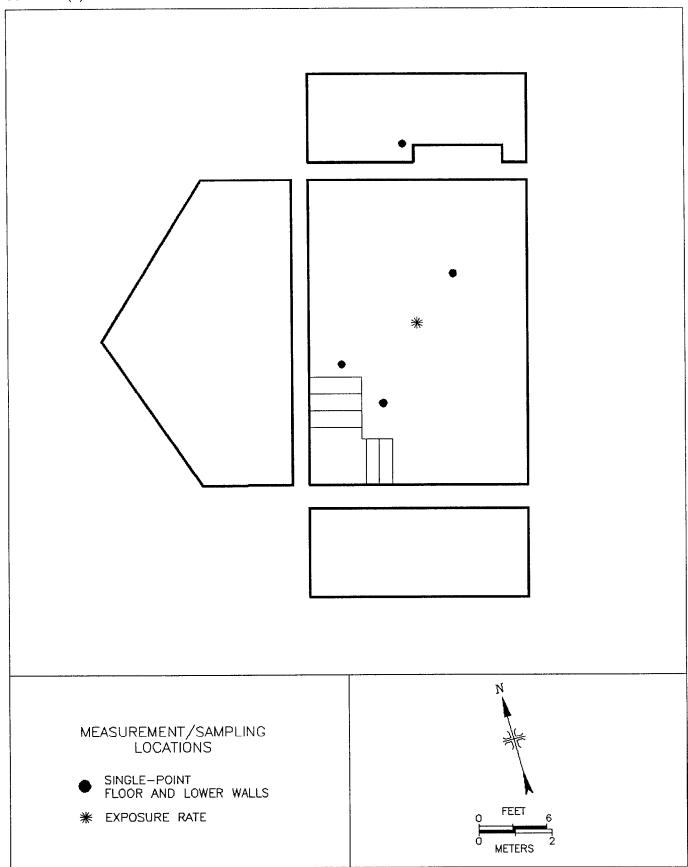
South Building, Area 5, West Mezzanine (Loft) — Measurement and Sampling Locations
